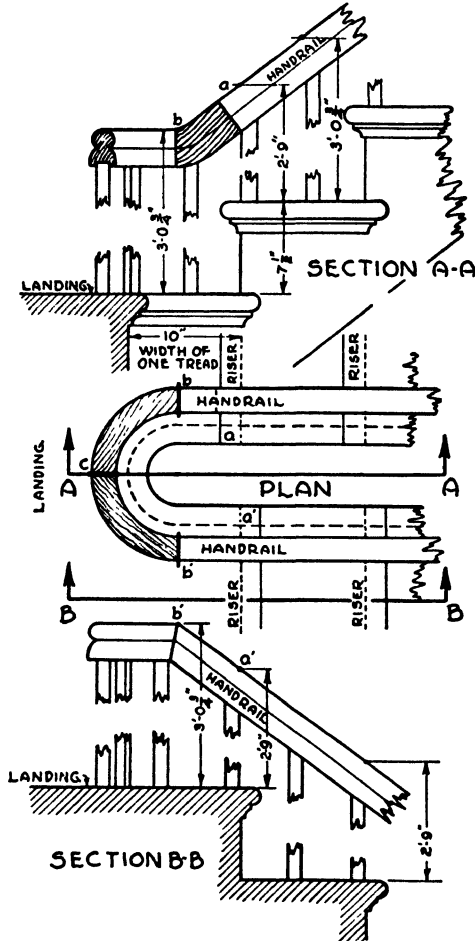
Geometrical Stair Showing Treatment of Handrail about Wellhole and Placement of Risers
